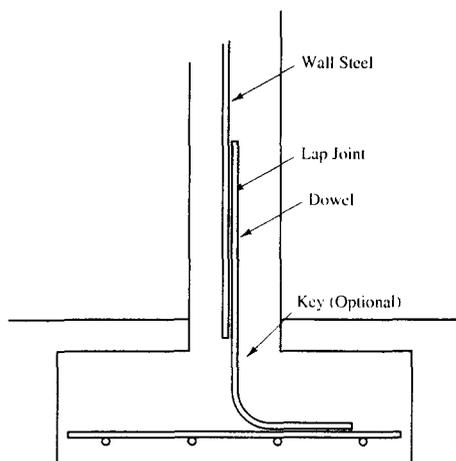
Use of dowels to connect a concrete or masonry column to its footing.
